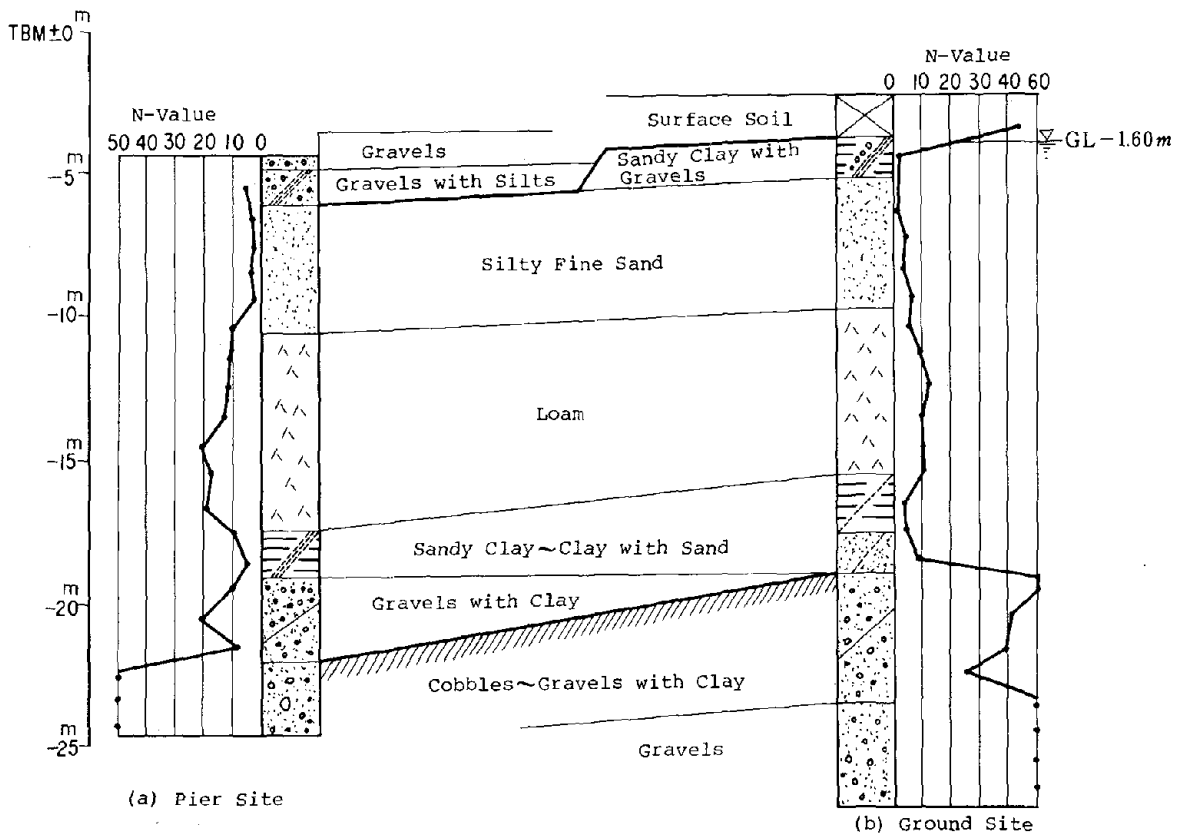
SOIL PROFILE AT THE PIER SITE AND THE GROUND SITE
